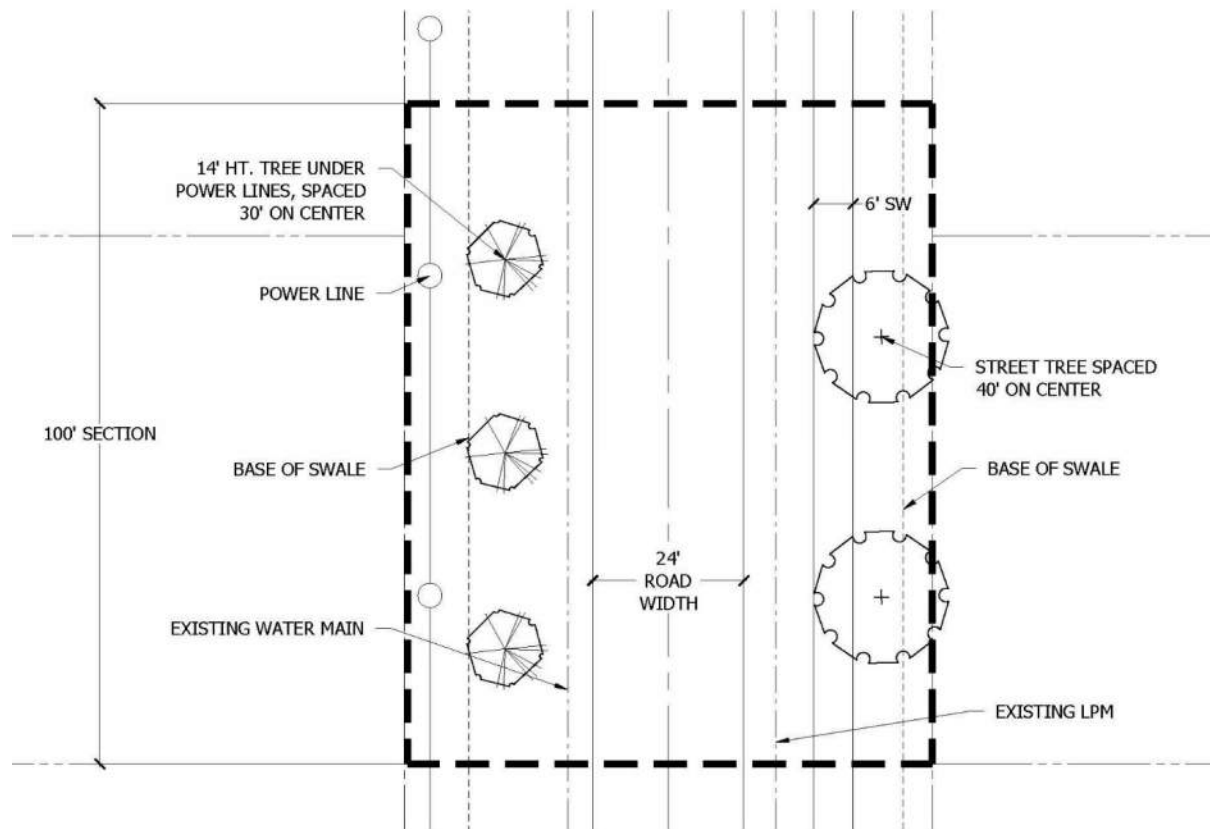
Typical 100-foot Plan View Section of 80-foot/100-foot Right-Of-Way
